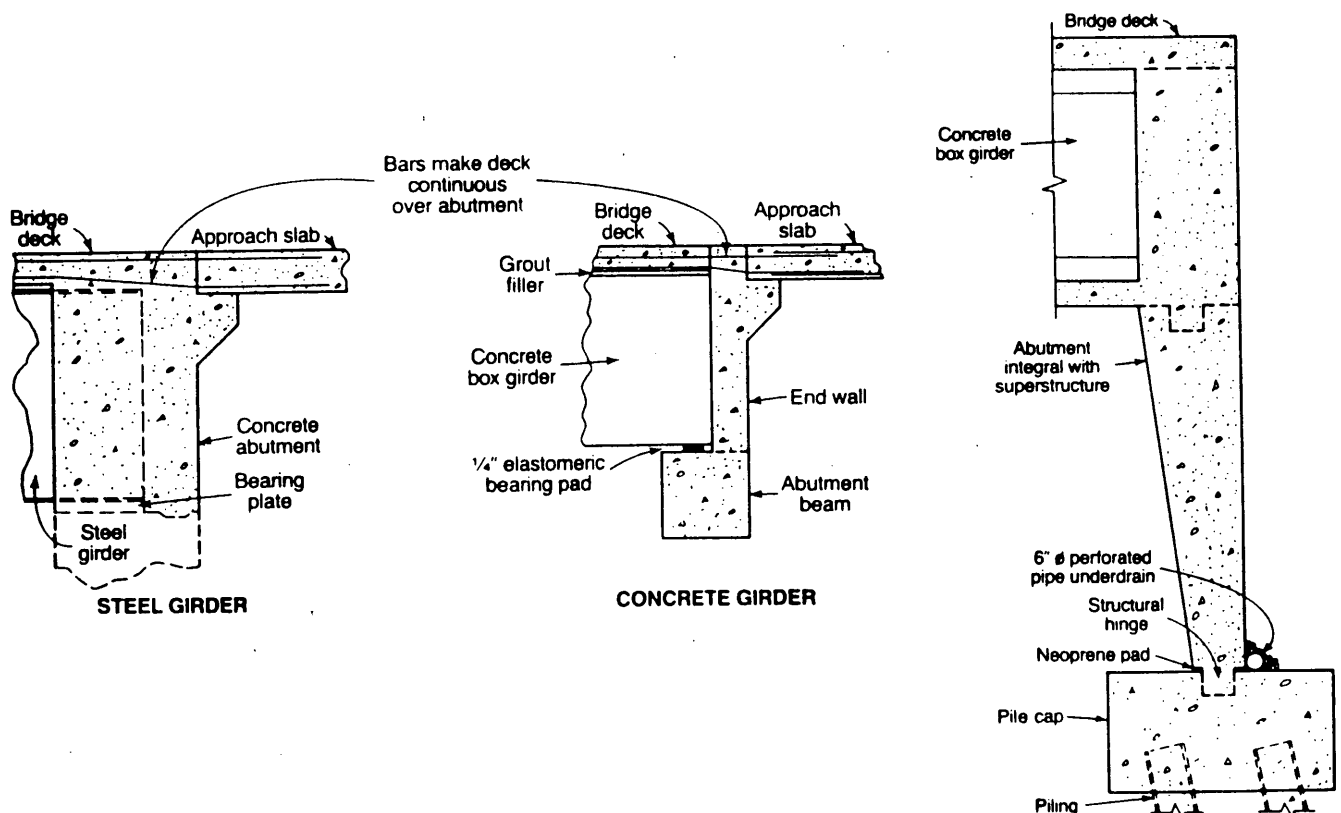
Typical details of integral abutment bridge construction used in Tennessee.
